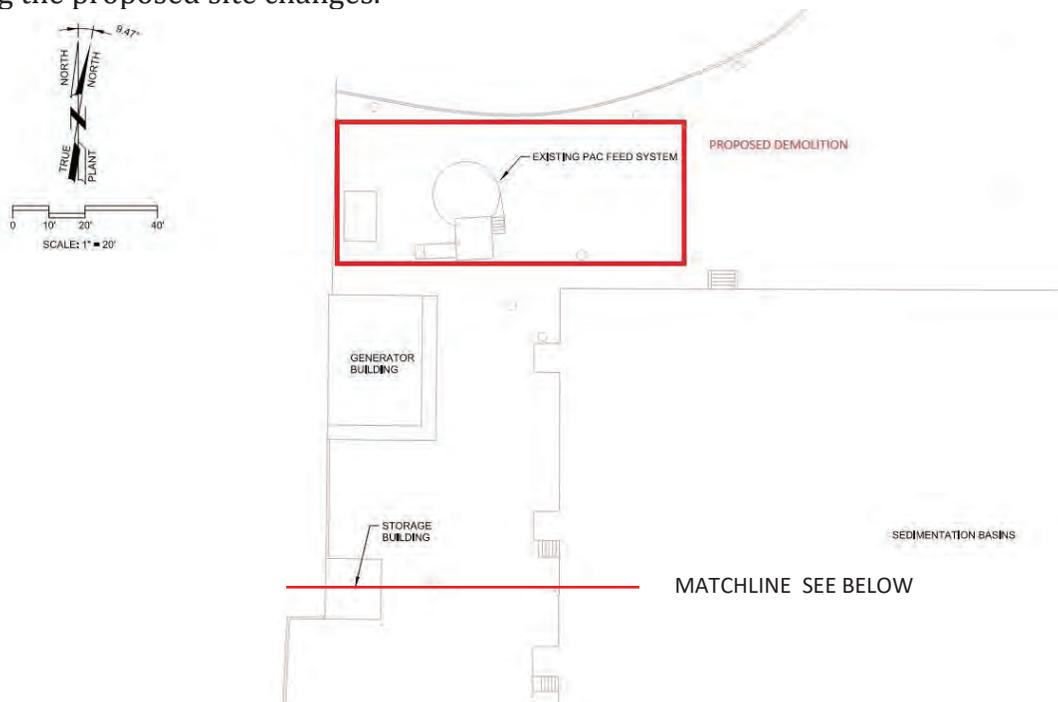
Figure A: Bountiful Weber Basin Water Conservancy District at 38 N Davis Blvd., Proposed Site Plan 2024
